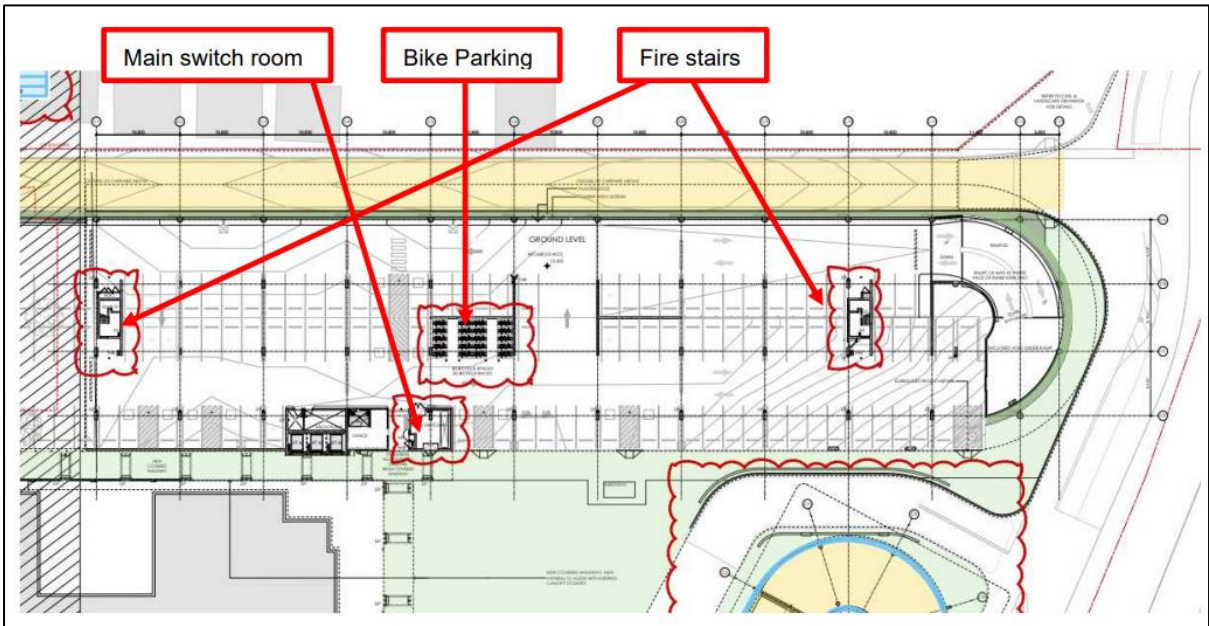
| Proposed internal reconfiguration, ground floor level (Source: Applicant's Modification Report 2021)
